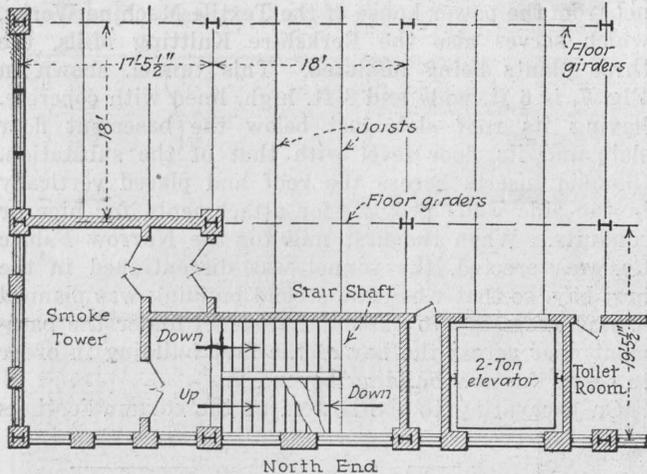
SMOKE TOWER AND STAIR SHAFT
